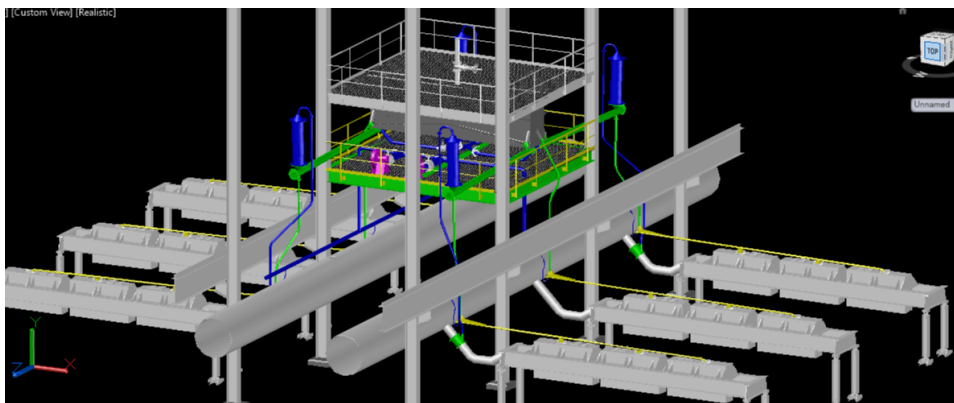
Pilot Plant with 6 pots and infrastructure for the future installation of 2 sections with 52 Pots.
